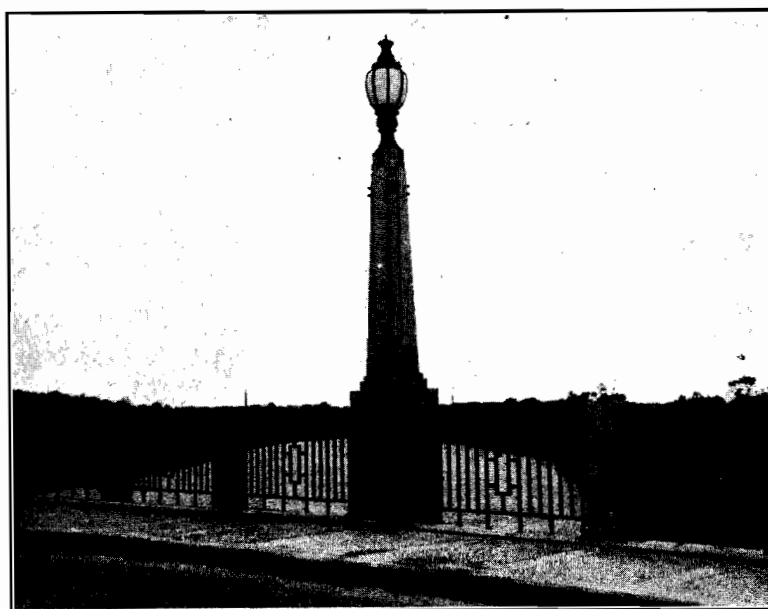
Maribyrnong River Bridge—Showing Parapet and Lamp Standard.
